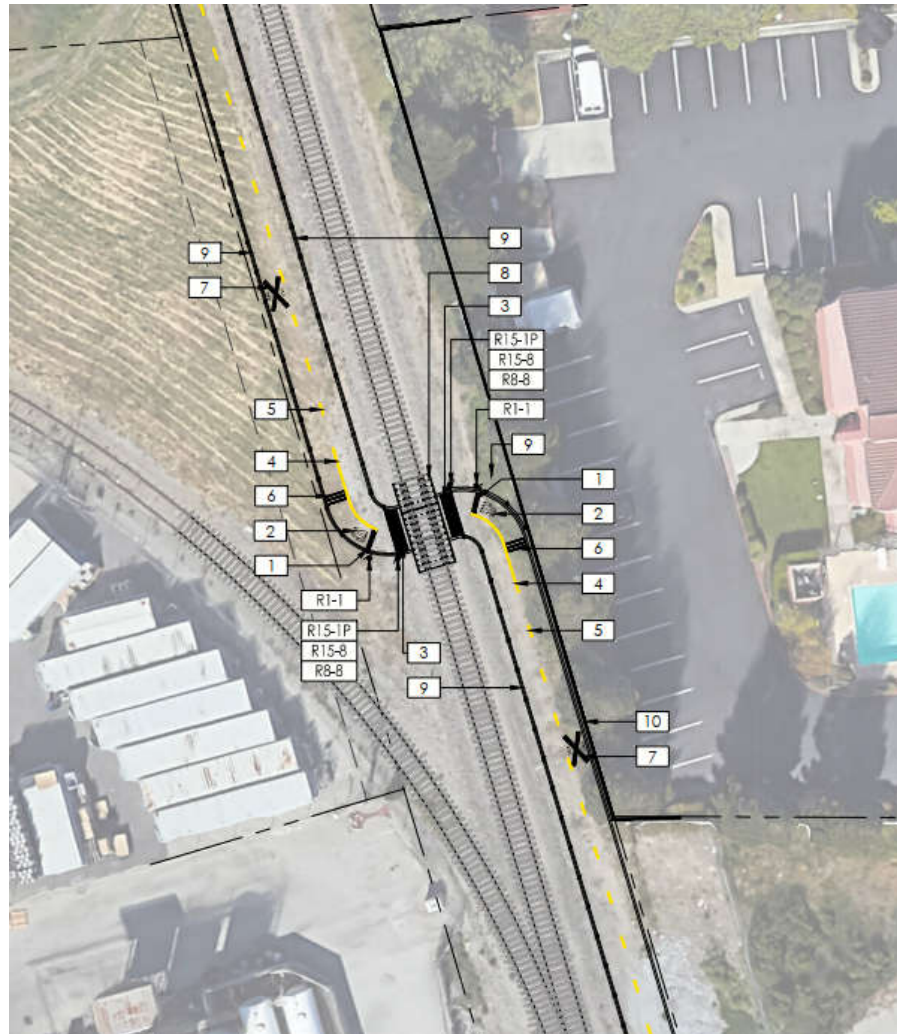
Modified Segment 18 Project Revised Lee Road Railroad Crossing
